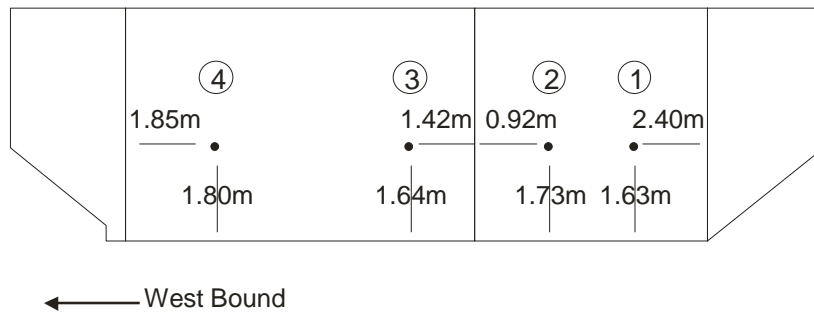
Treatment and monitoring plans for the Green Point Road bridge over I-395.
